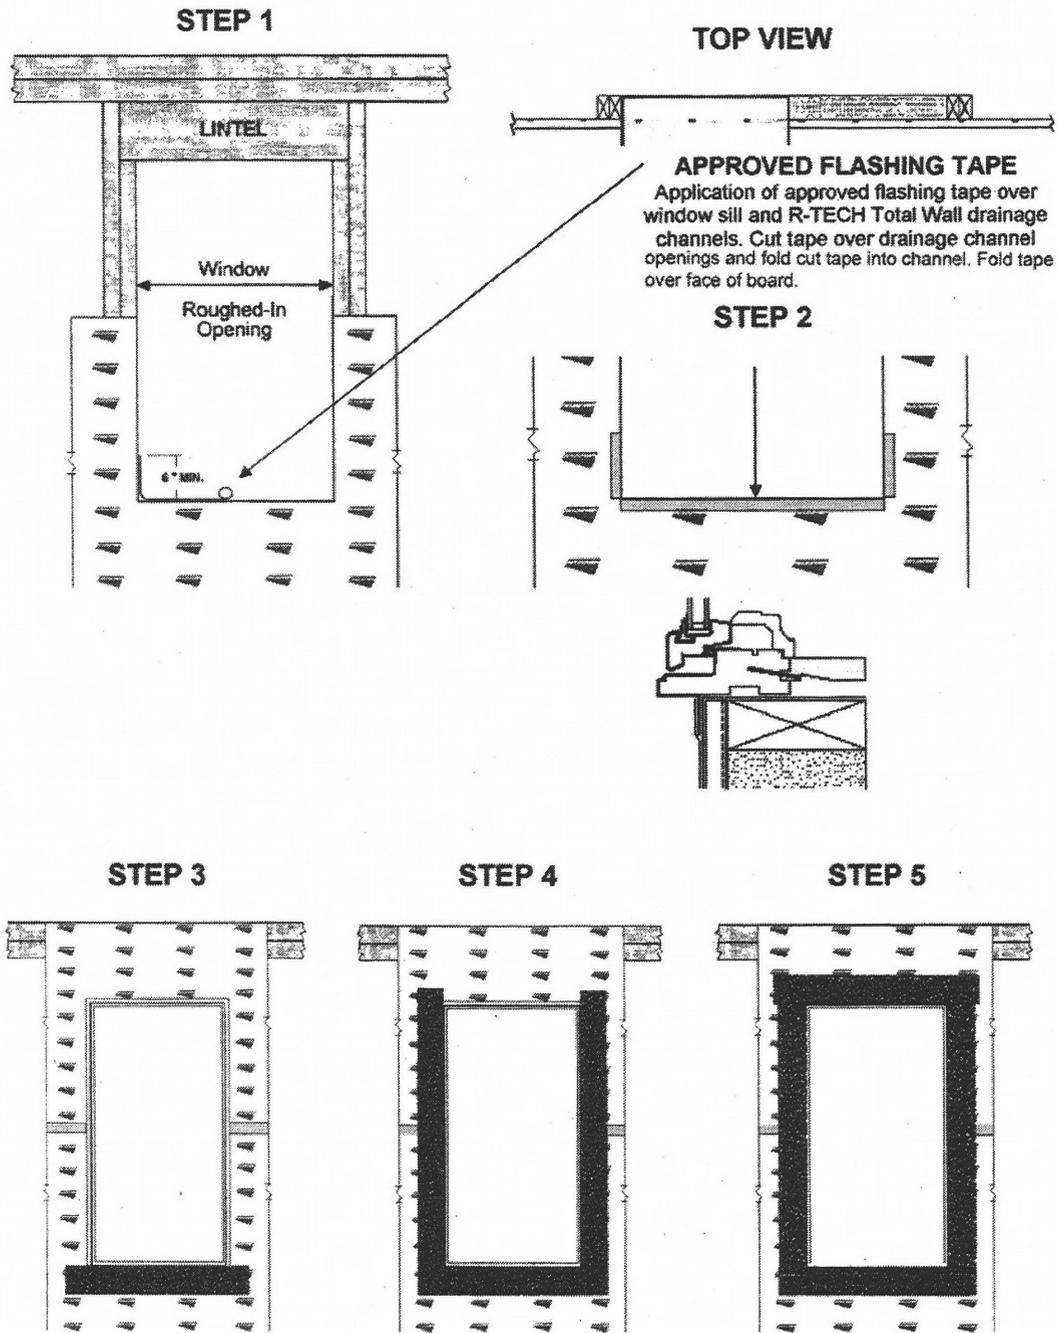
INSTALLATION DETAILS FOR R-TECH ONE-COAT STUCCO BOARD INSULATION USED AS A WEATHER-RESISTIVE BARRIER
